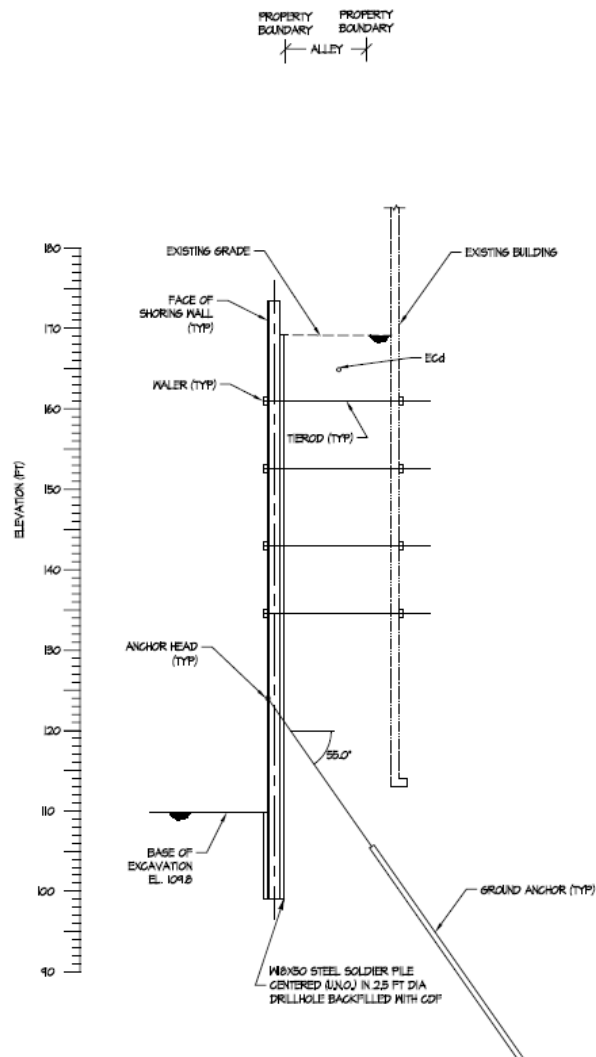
The Eight North shoring wall showing tierods anchored into the southern wall of the 929 parking garage. Image sourced from The Eight shoring wall plan set.
